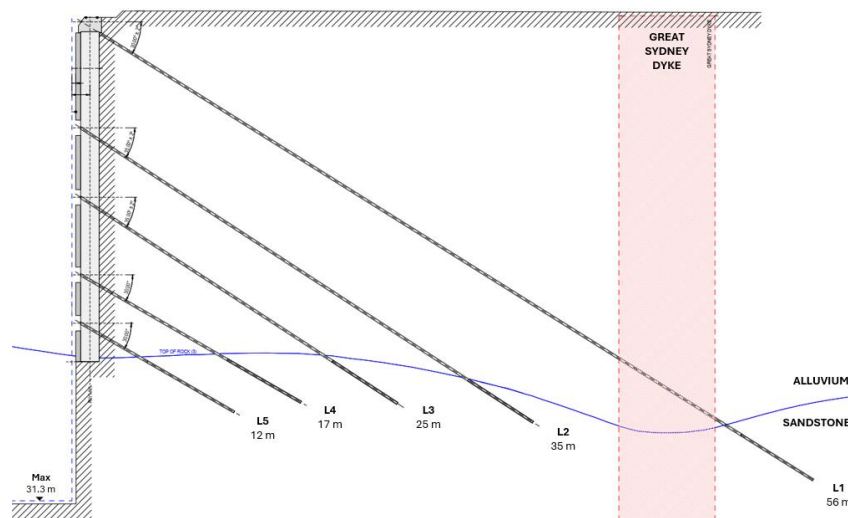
Anchored piled wall – Western part of the station box. Typical section
